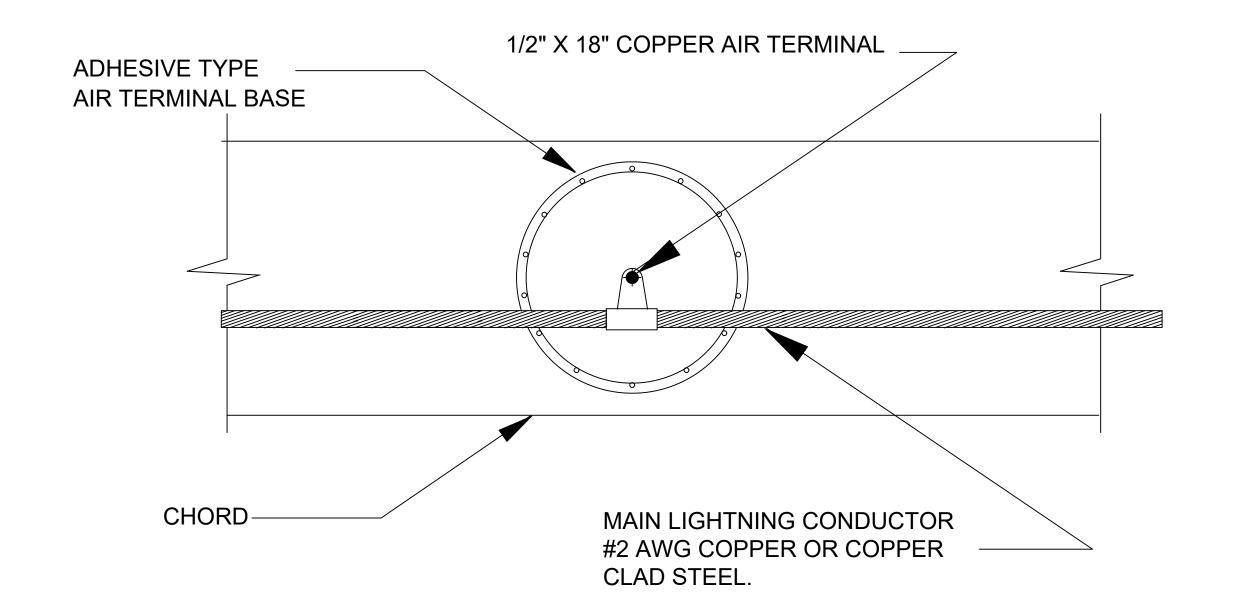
DETAIL "B" - ROOF TOP MOUNT AIR TERMINAL N.T.S.
